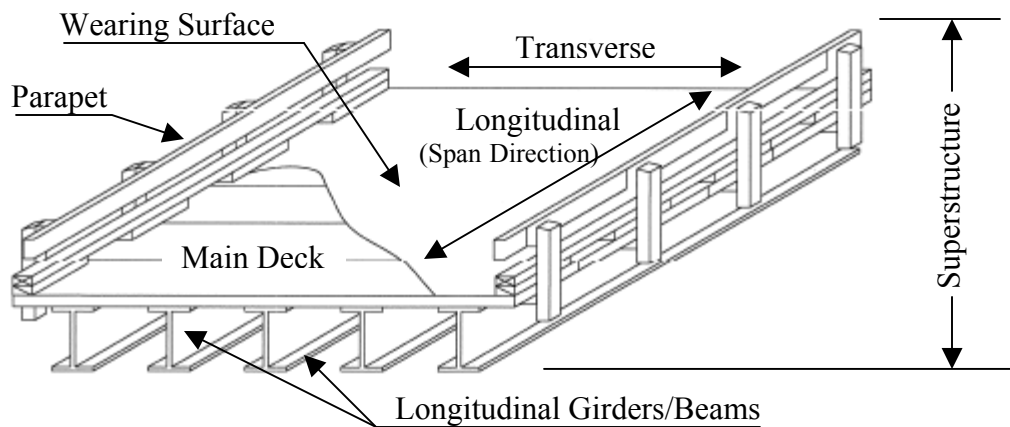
Superstructure of a bridge illustrating bridge engineering terms
